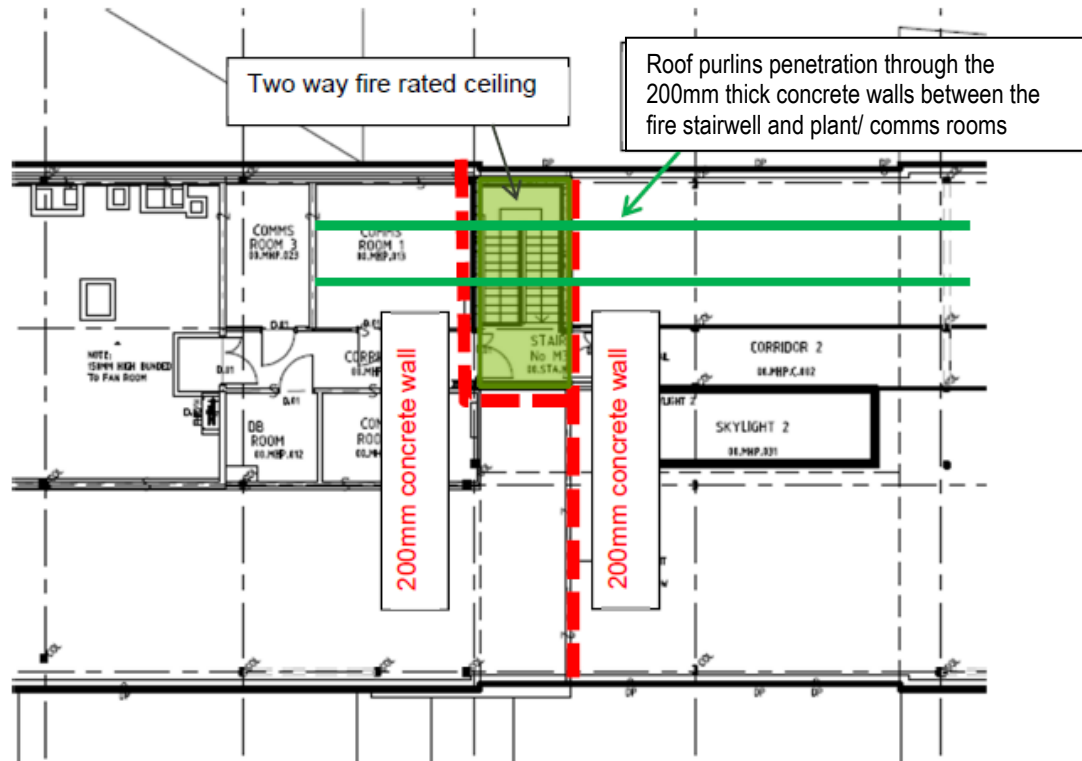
Item 3 - plan view of IPU 2/1 and IPU 3/2 fire wall penetrations
